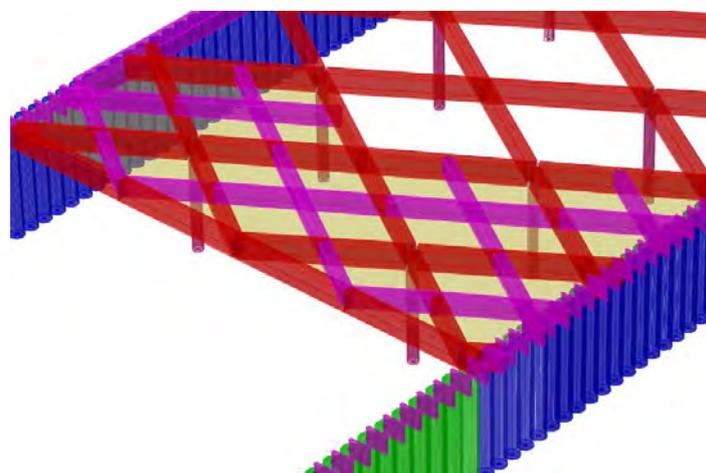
Numerical structural model of pedestrian bridge over Zone C
